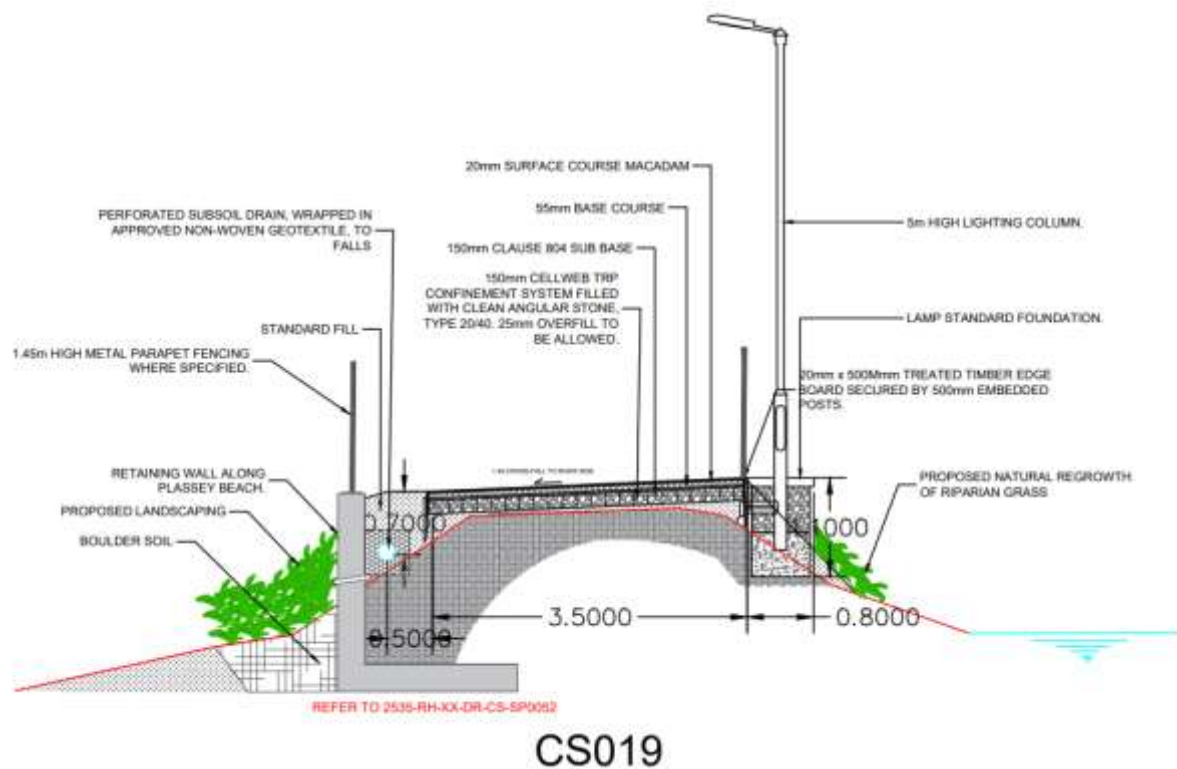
Proposed section of retaining wall for ramp at Plassey Beach
